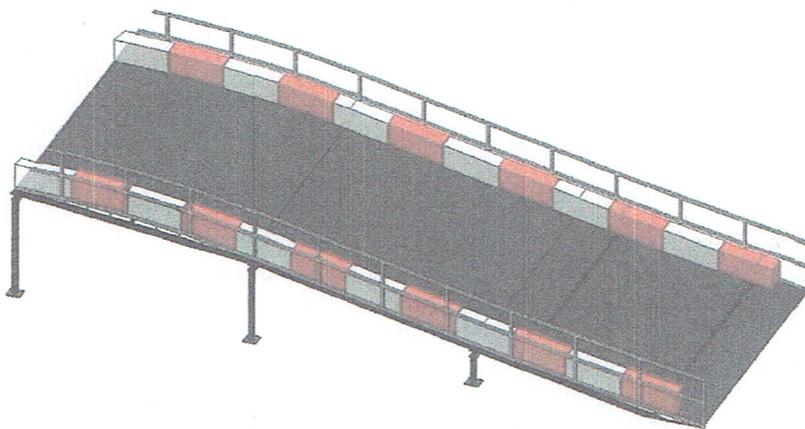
Demo image without structural details; module 15.000x6.000x2.500 mm
